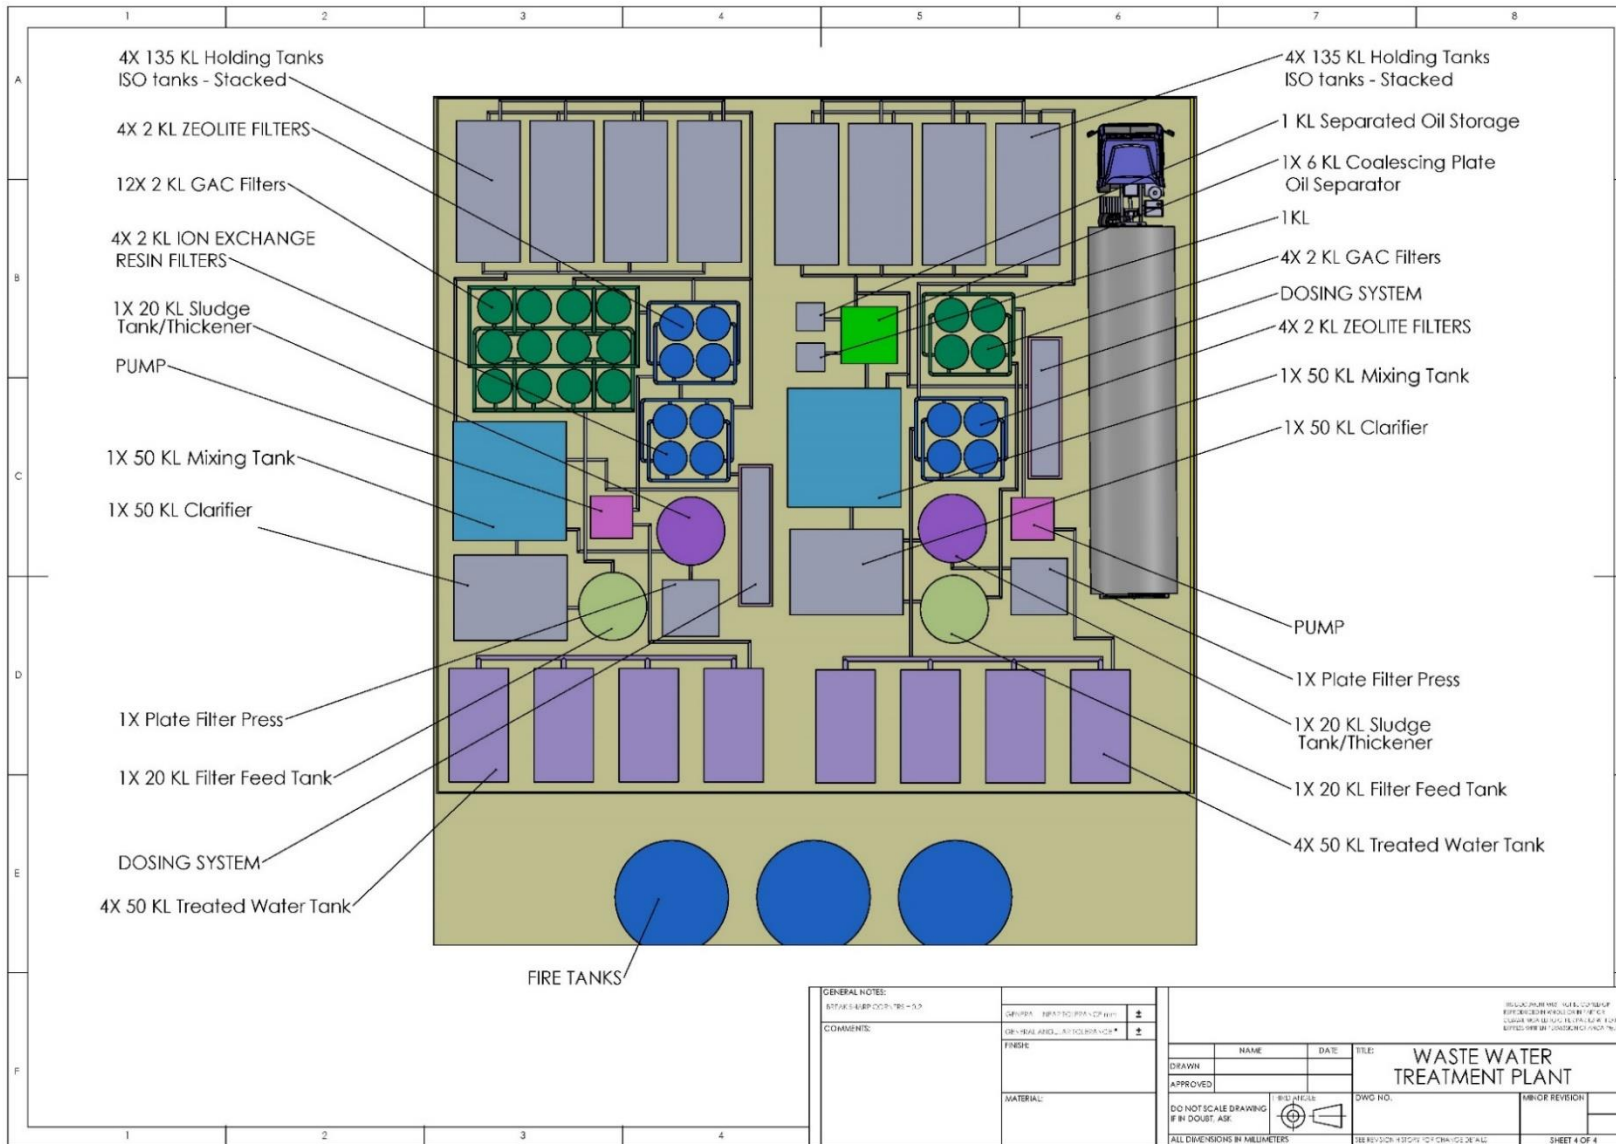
Liquid waste treatment plant schematic (subject to detailed design)
